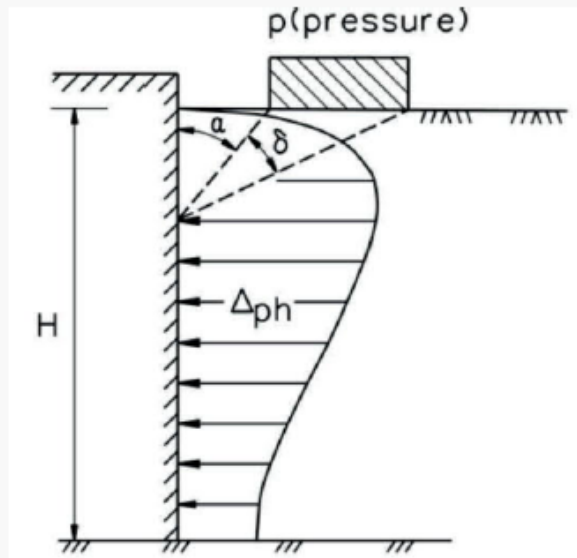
Horizontal Pressure on Wall Caused by a Uniformly Loaded Strip
